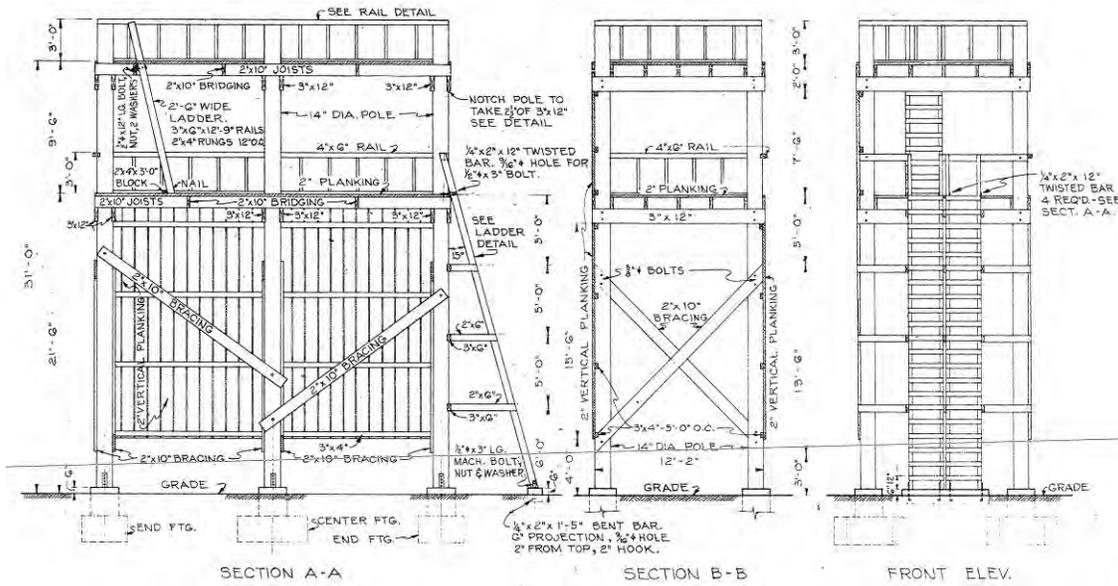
Cargo net mock-up, sections and elevation, Fort Bragg, NC, 1952 (standard drawing 28-13-32 sheet 1 of 2; cargo net mock up, plans and details; 1 April 1952).
